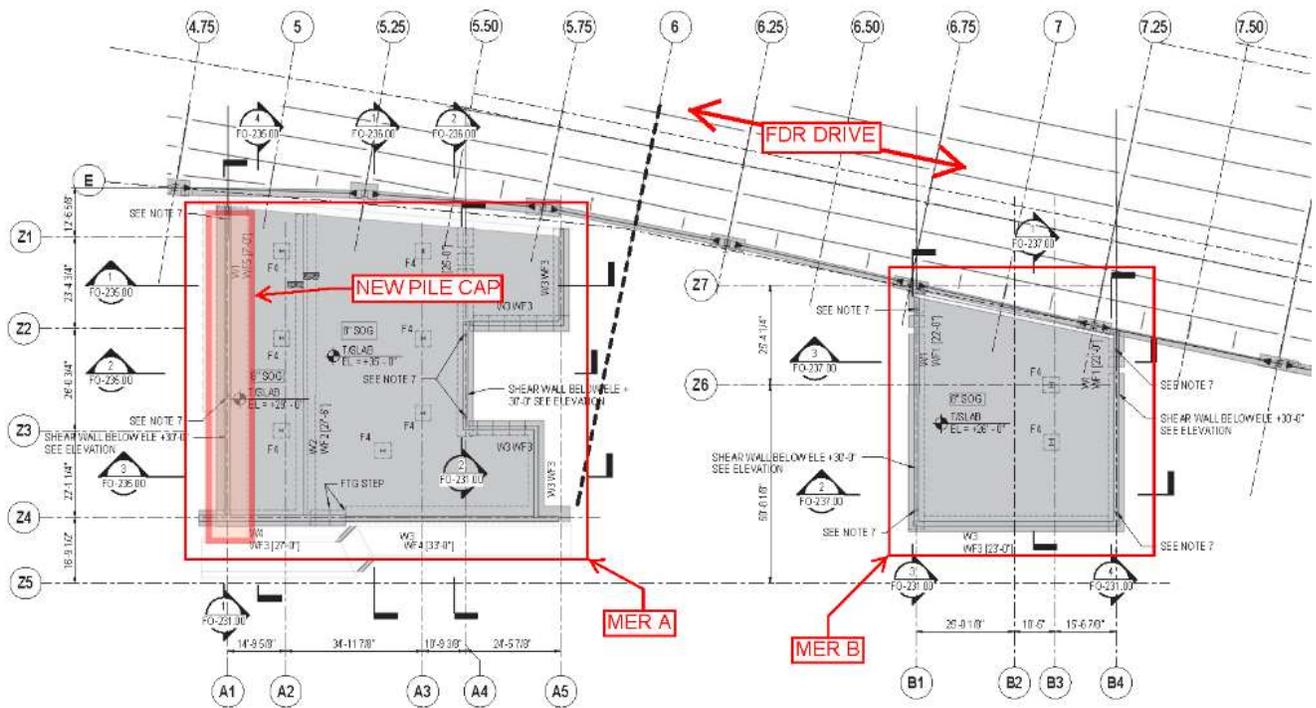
A. Original foundation plan of MER A and B and the outline of the proposed pile cap.
